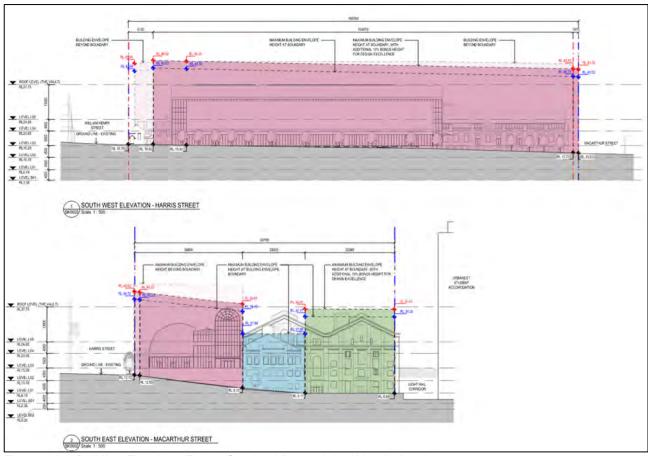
Building Envelope Zones Section Views (John Wardle Architects)
